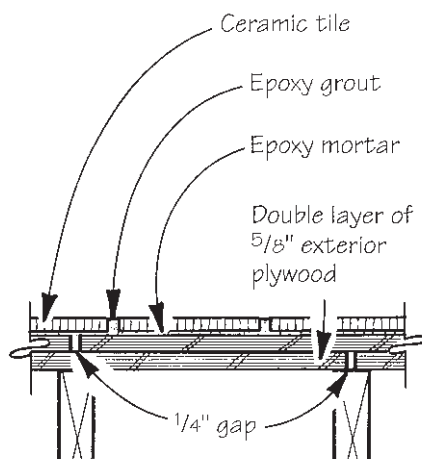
For dry installations, exterior-grade plywood is an acceptable underlayment for tile. Make sure you use a tile adhesive warranted for use with plywood.
